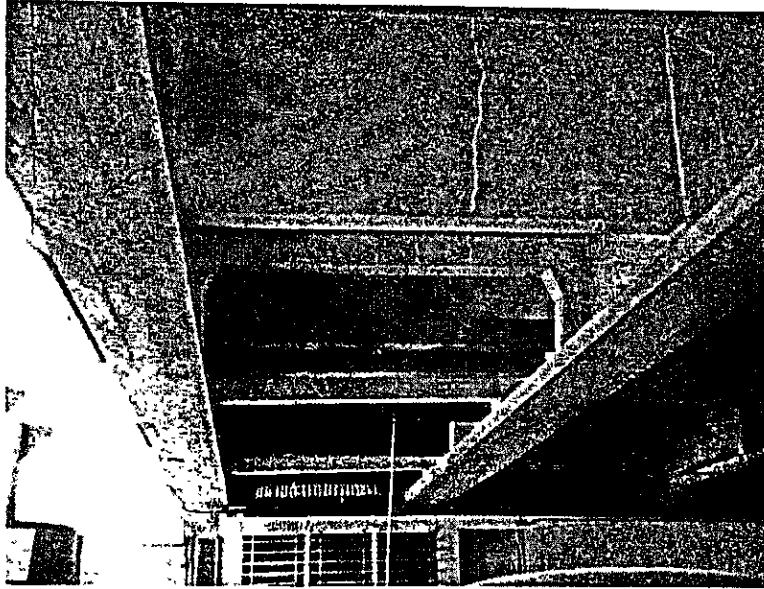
Cracks and Timbering under the RC Slab at the PC Composite Girder (B.K.K Side)
